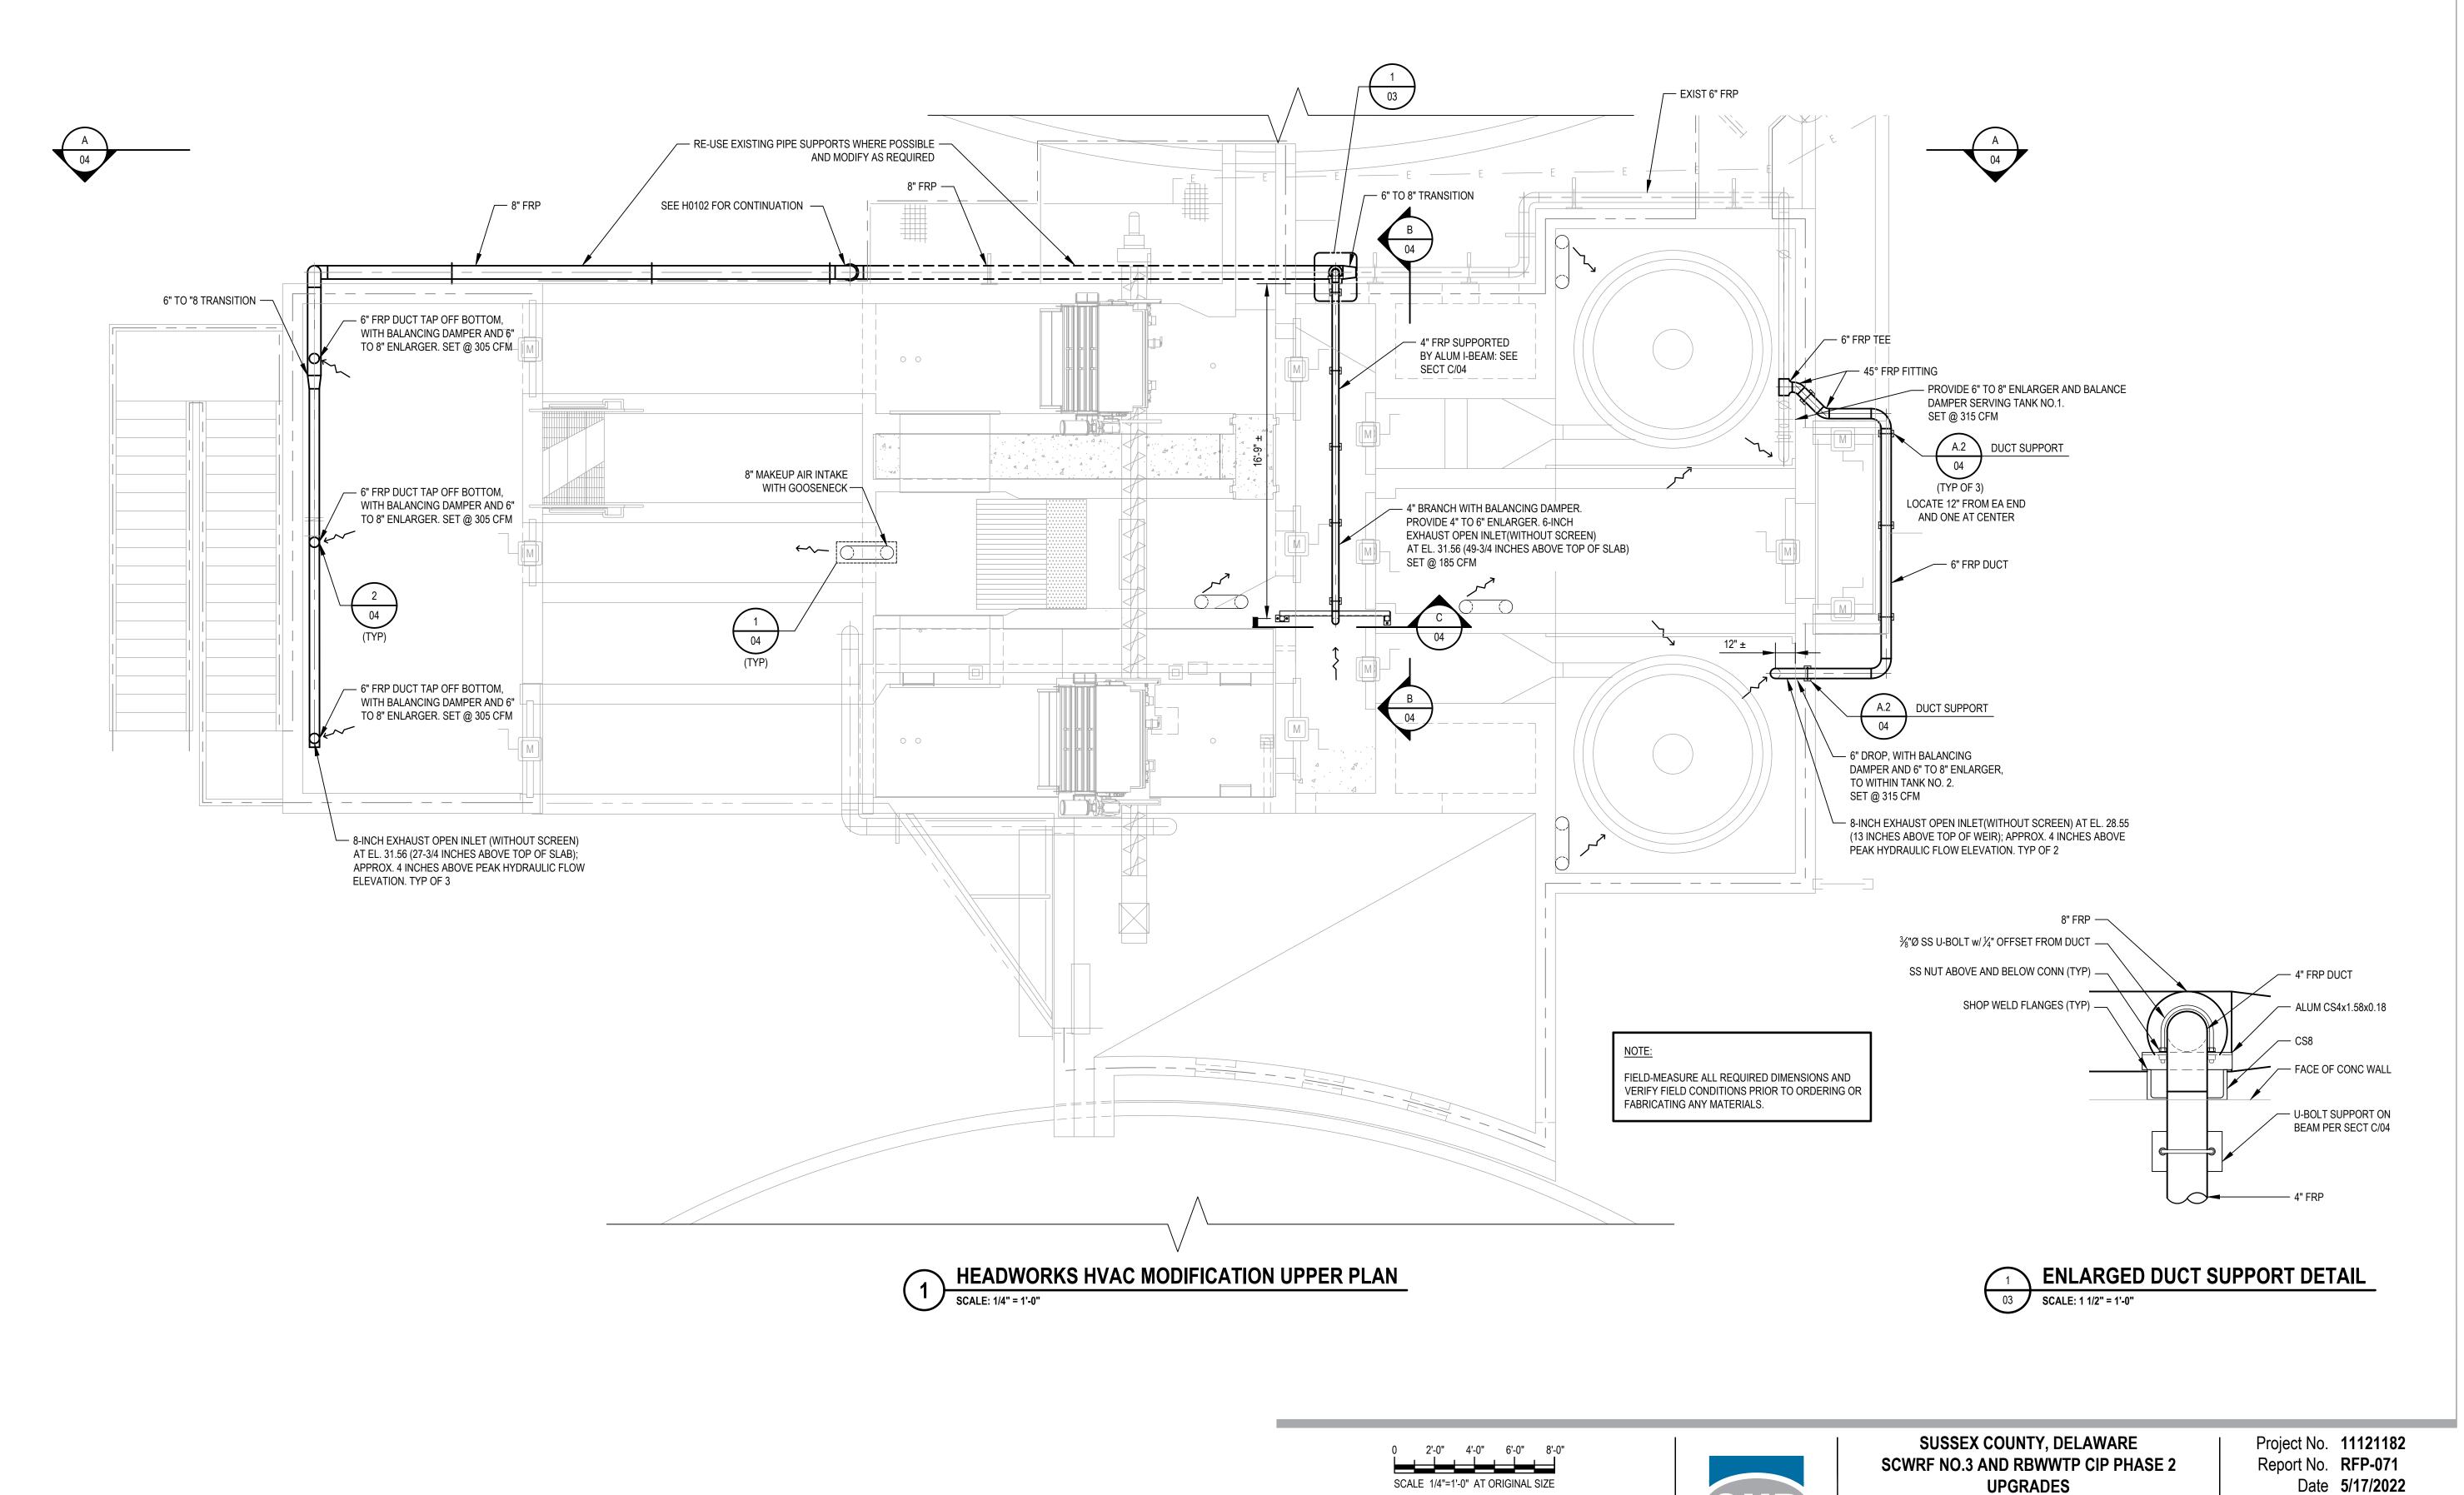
HEADWORKS HVAC MODIFICATION PLAN
